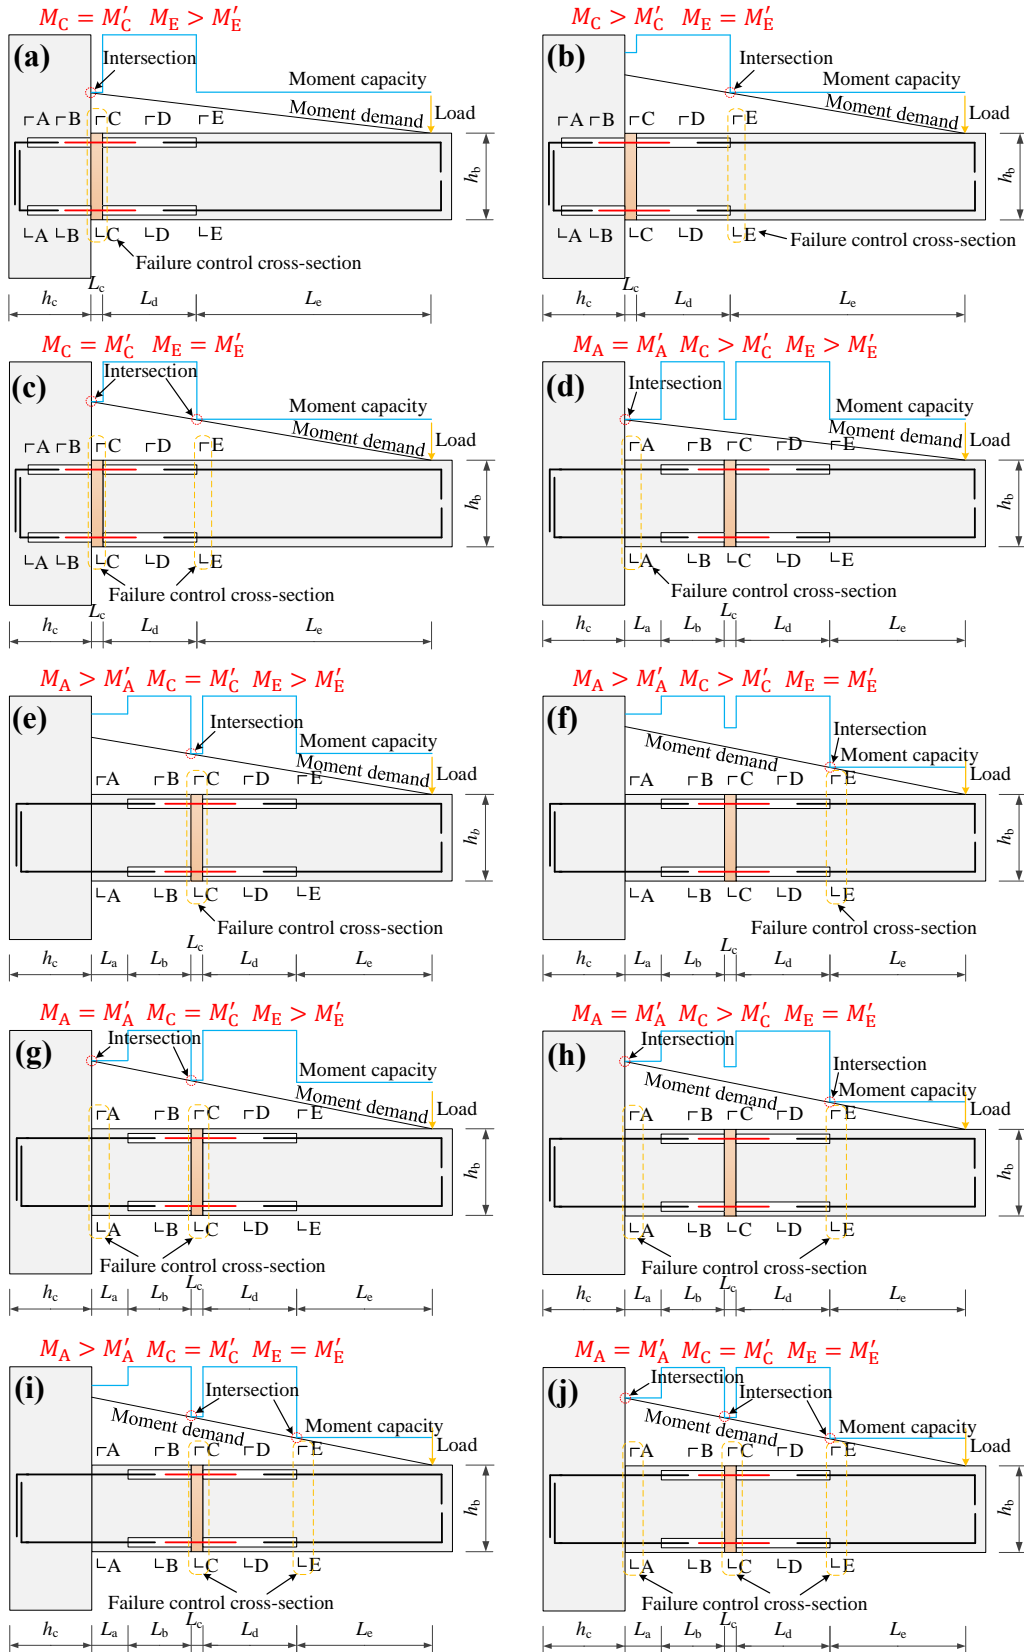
Failure control cross-section of the proposed beam-column connection: (a)-(c) without a protruding beam; (d)-(j) with a protruding beam.
